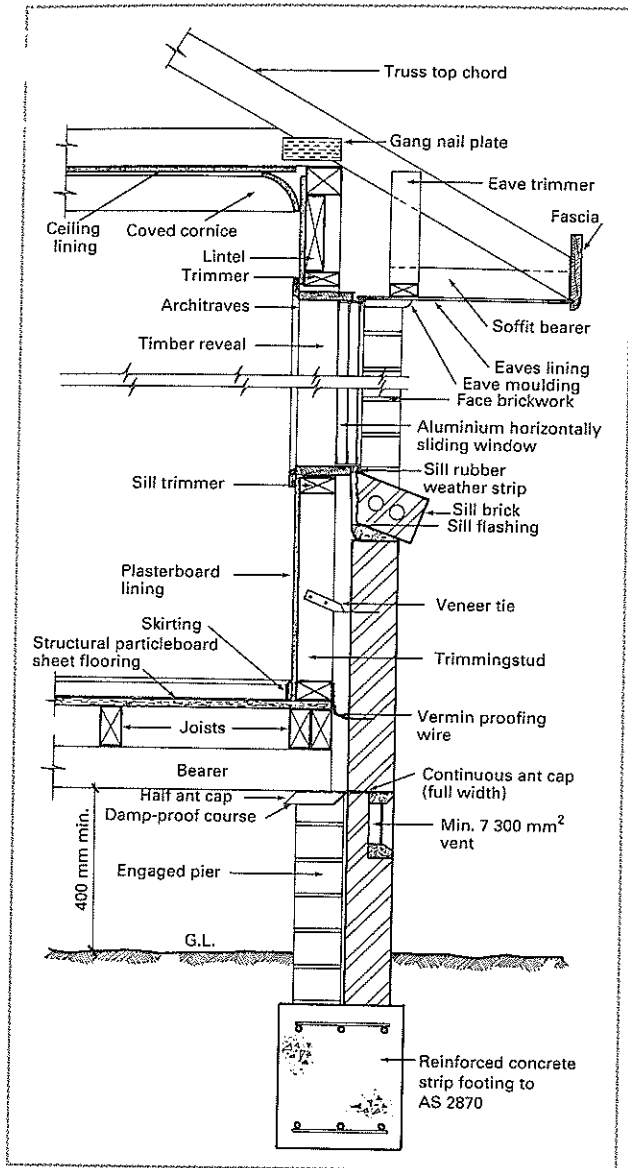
Vertical section through an external brick veneer wall and horizontally sliding aluminium window
